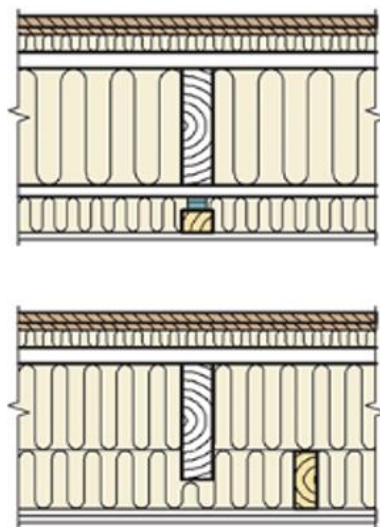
Floor slabs – possibilities of vibration isolation, sectional view
